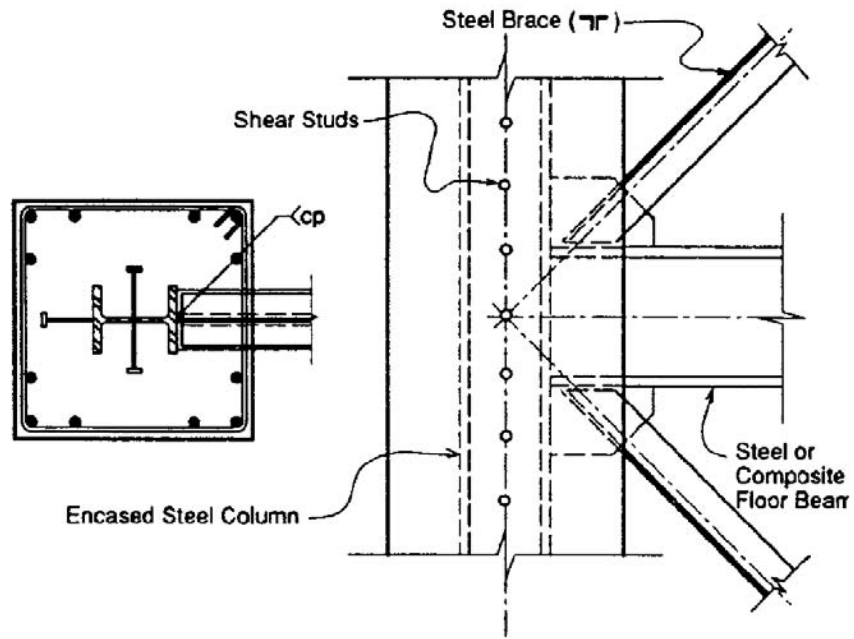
Reinforced concrete (or composite) column-to-steel concentric brace.
